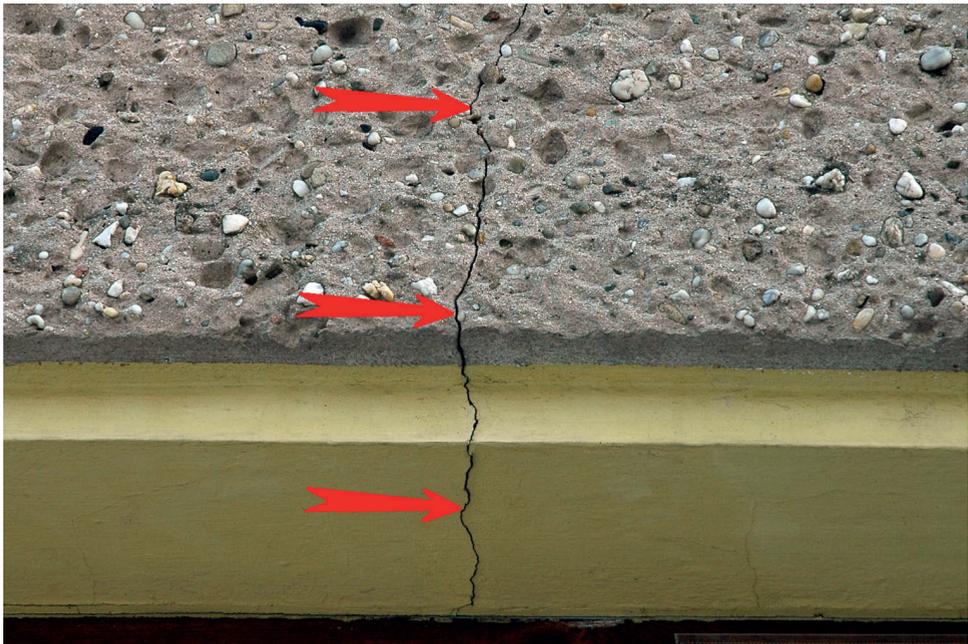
Fragment of the western wall – vertical crack above ground floor window opening. *Source: author
